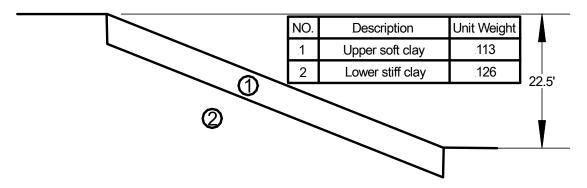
Cross-section assumed for stability condition B at the I70-Emma test site.
